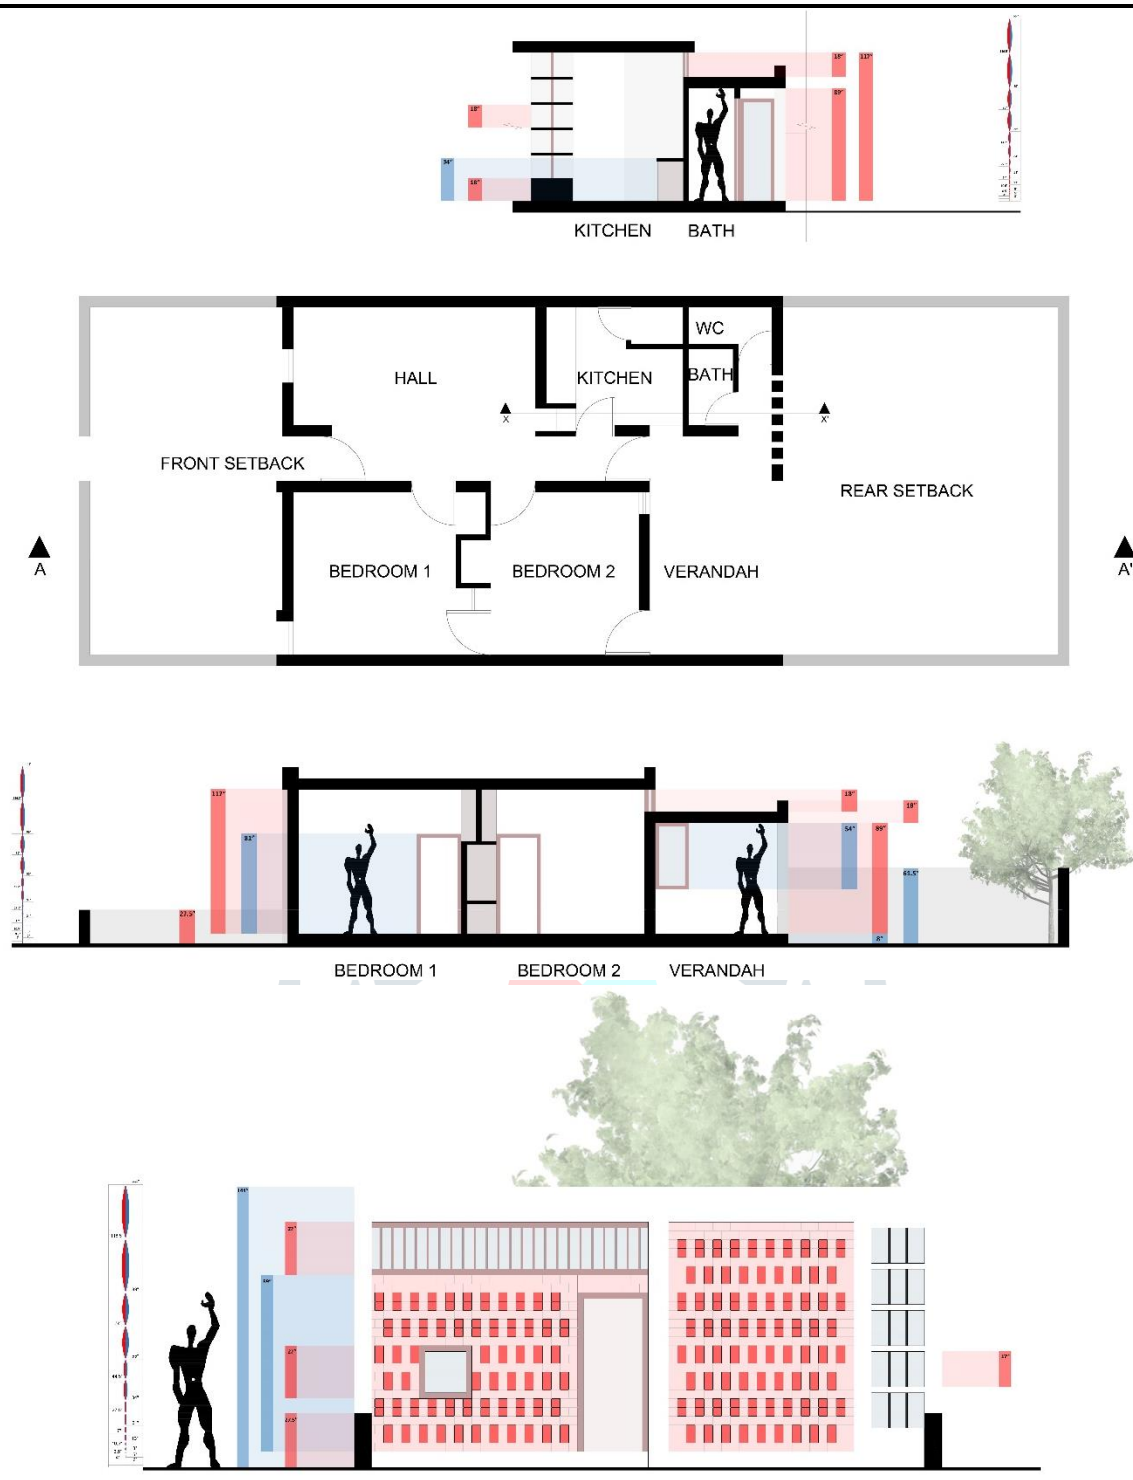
Plan, Sections and Elevations of Government House of Phase 1 showing the use of Le Modulor.
